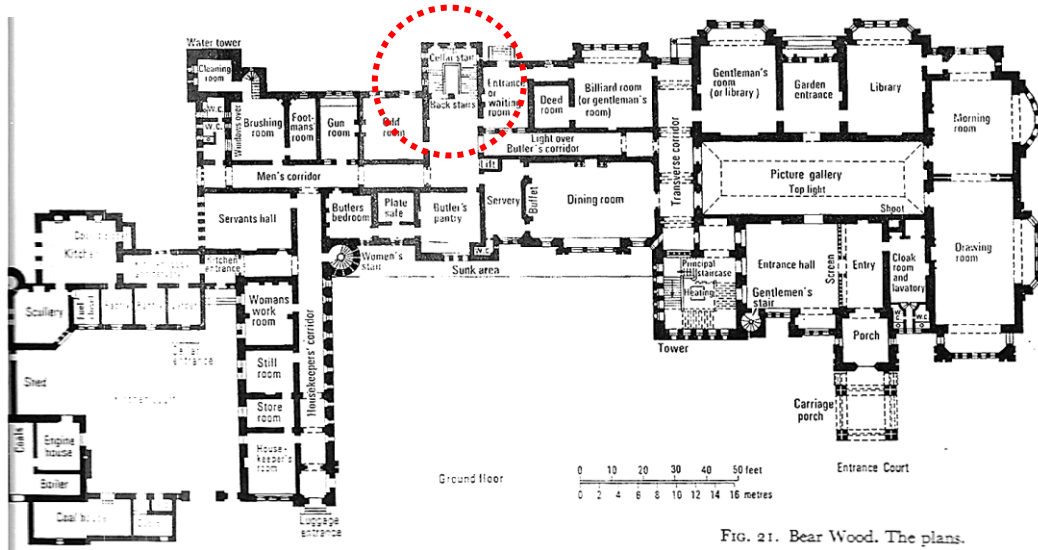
Ground Floor – Historic plan. 'Back Staircase' marked in red.
